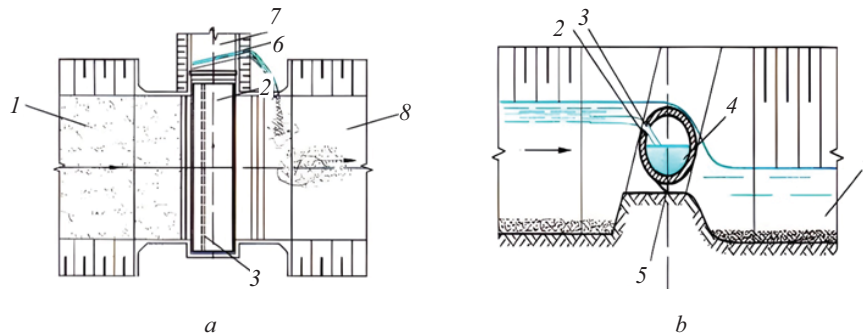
Mountain water intake scheme: *a* — layout; *b* — longitudinal section [3]; 1 — upstream water; 2 — rolling-drum gate; 3 — slotted opening; 4 — intake gallery; 5 — segmented sheet; 6 — gravel traps; 7 — discharge channel; 8 — downstream water
